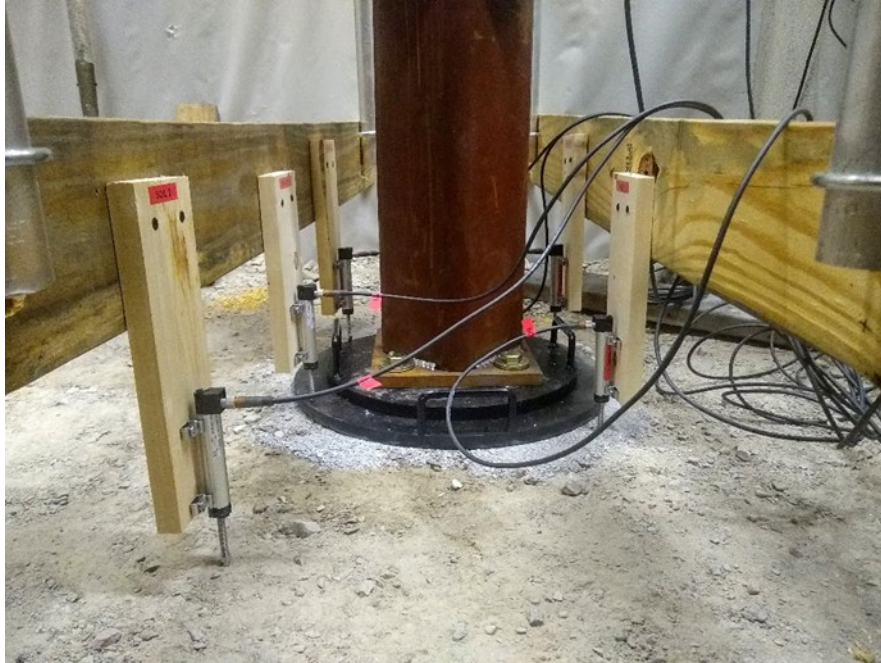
Photo of Load Plate Assembly. A set of three plates are used to increase the stiffness of the assembly.
